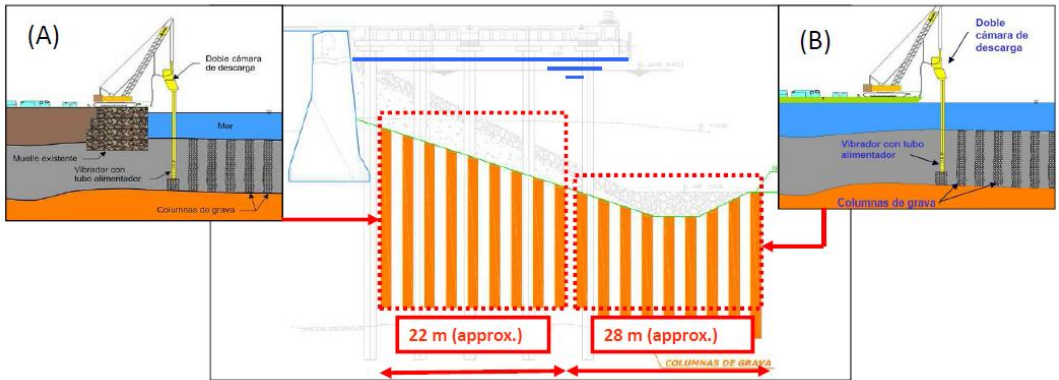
Stone columns performed from existing berth structure and from barge – typical section.
